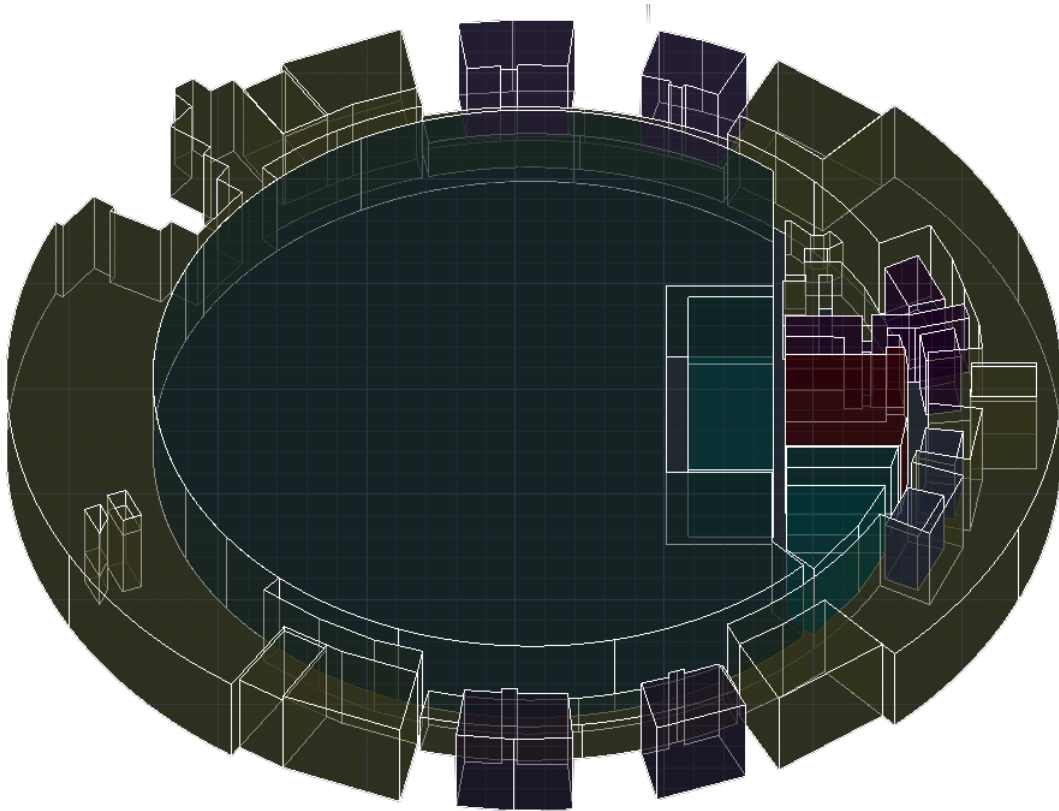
The 3D extruded cross-section of the containment at 21.5 m.
